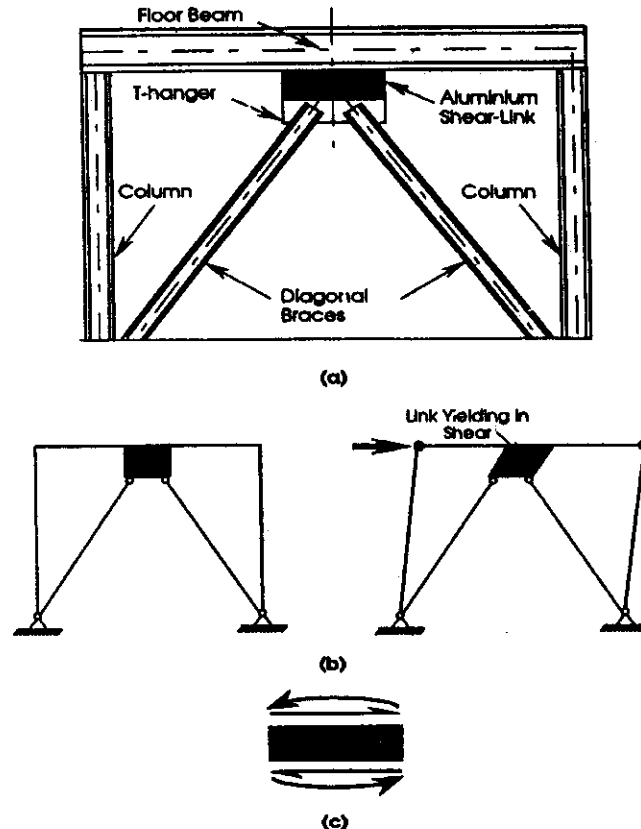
(a) Schematic diagram, (b) Typical collapse mechanism of the proposed bracing system, (c) The isolated shear-link from the bracing system (Rai and Wallace, 1998)
